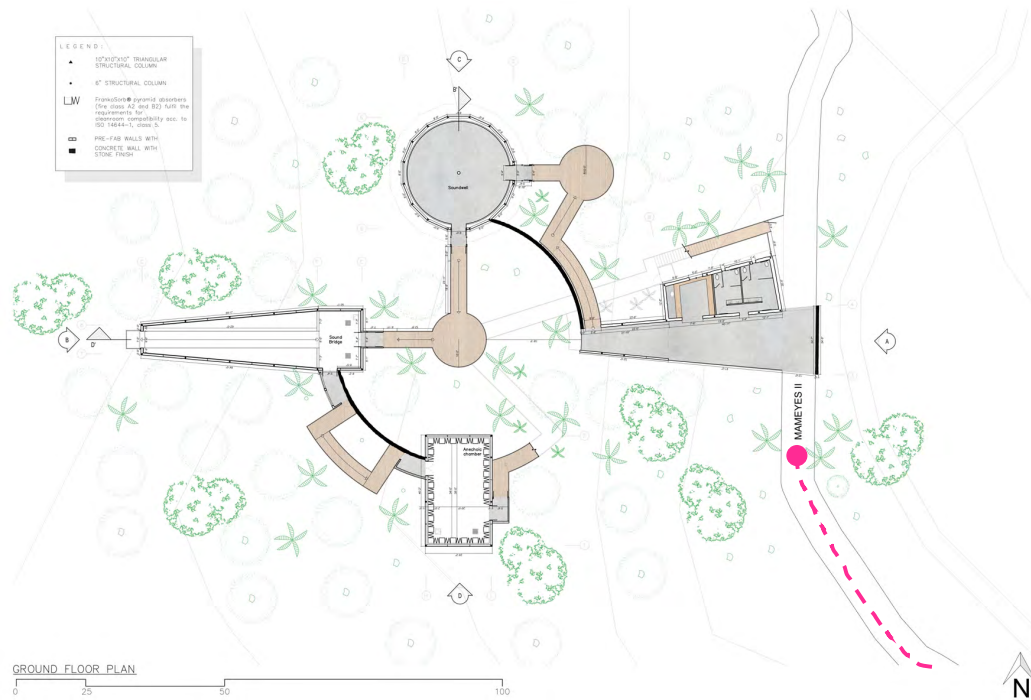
Proposed Ground Floor Plan. Diagram by student Reinaldo E. Hernandez Aracena.
